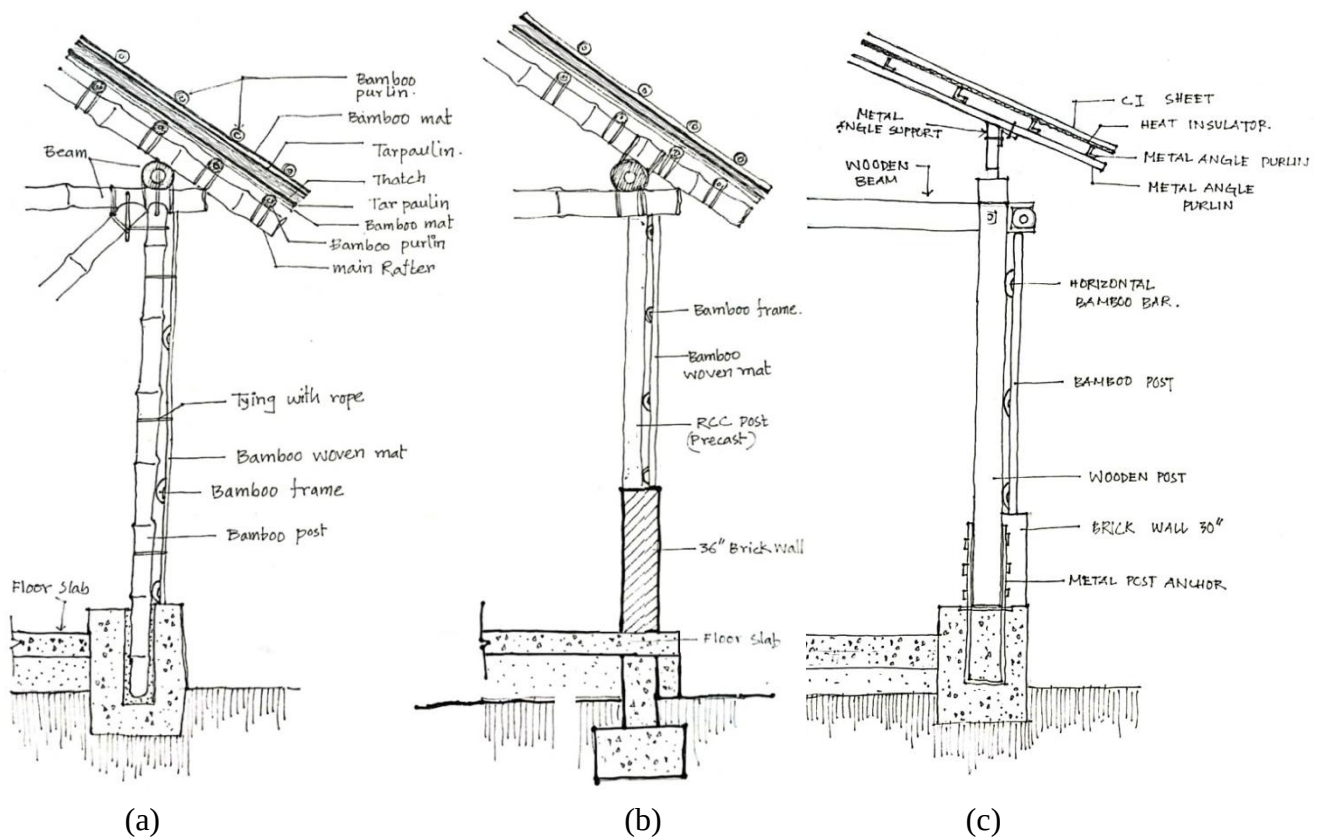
Sections of material use in selected CFSs. (a) bamboo column-beam, bamboo woven wall, and thatch roof (b) precast column-bamboo beam, bamboo woven wall with 36" brick wall, thatch roof, (c) wooden post-beam, bamboo post wall with metal purlin and CI sheet roof. Source: Field survey by Author, 2021
